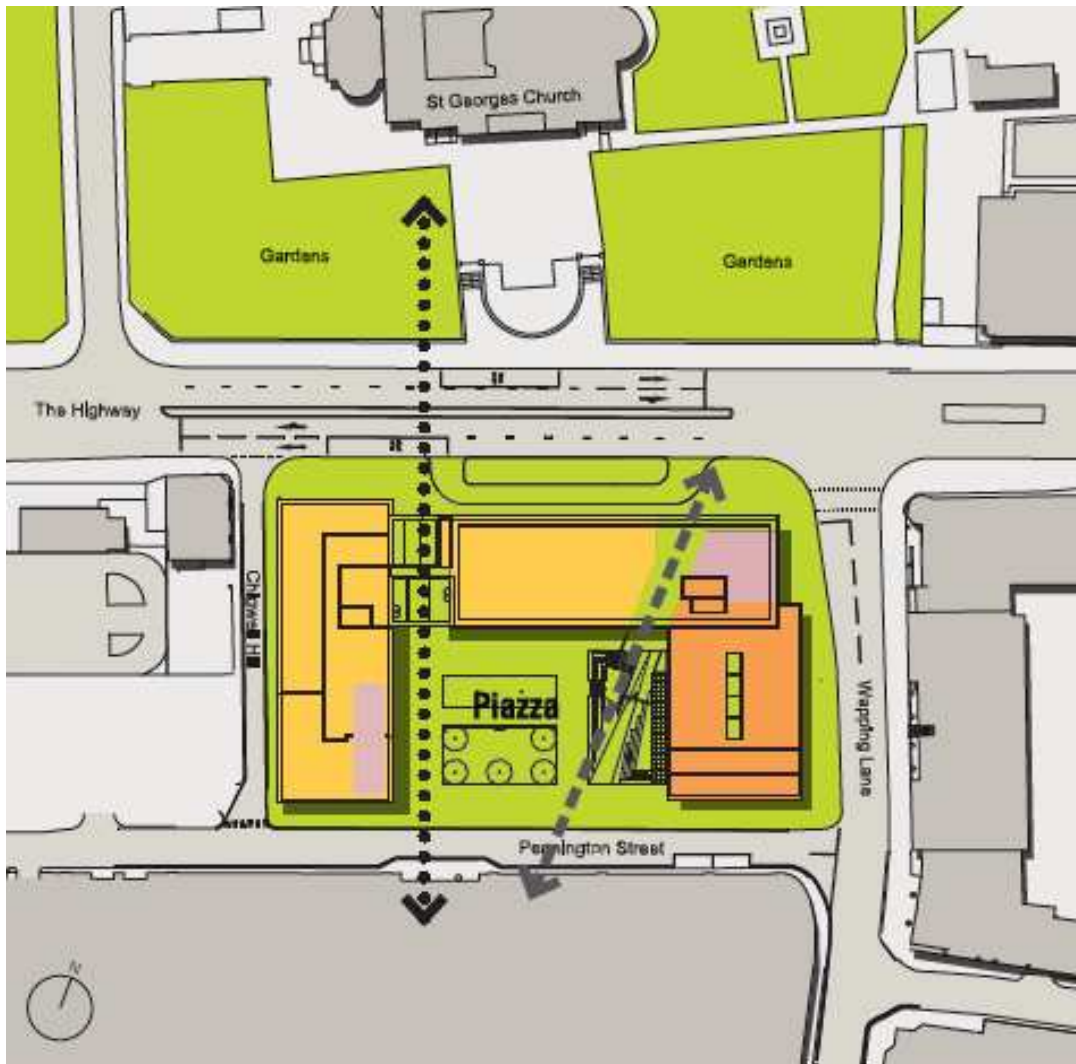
Site layout with pedestrian thoroughfare (dashed line) and visual link (dotted line) between St Georges Church and Tobacco Dock indicated
